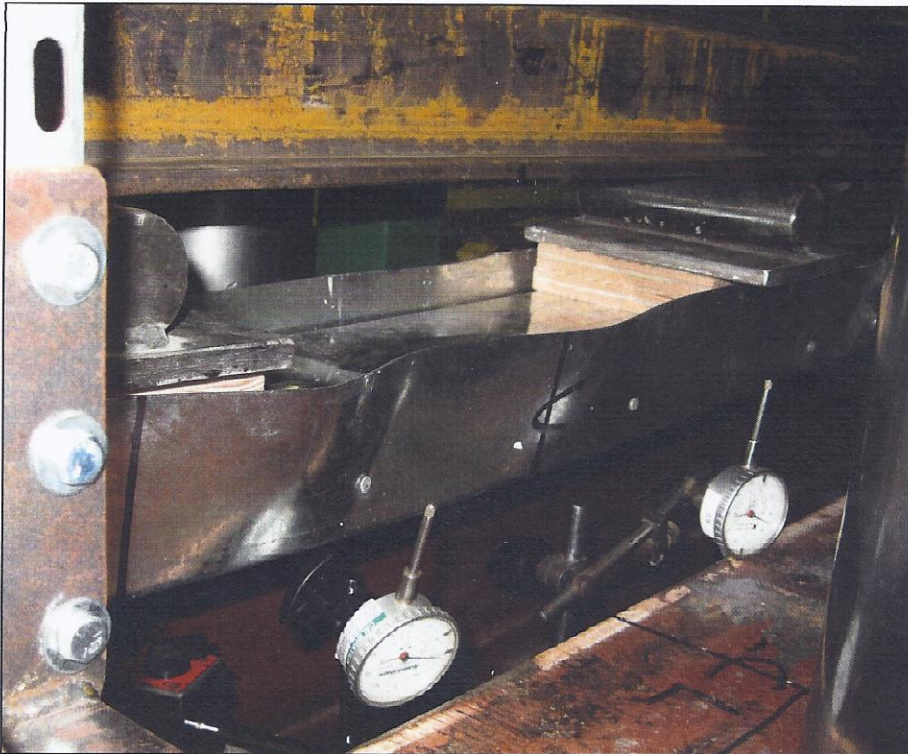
Weak Axis Bending, Outer Flange Buckling
